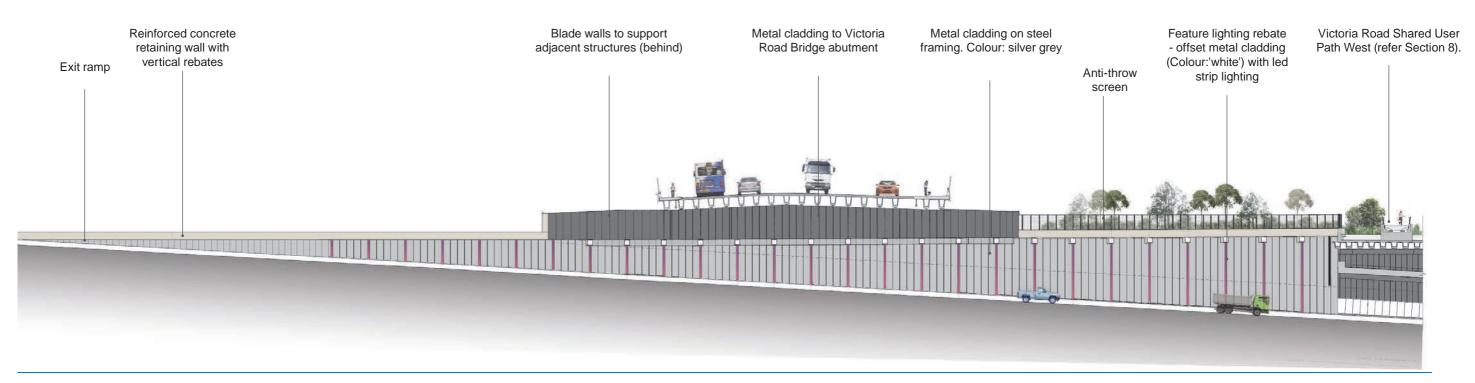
M4-Anzac Exit Portal - south dive wall elevation
